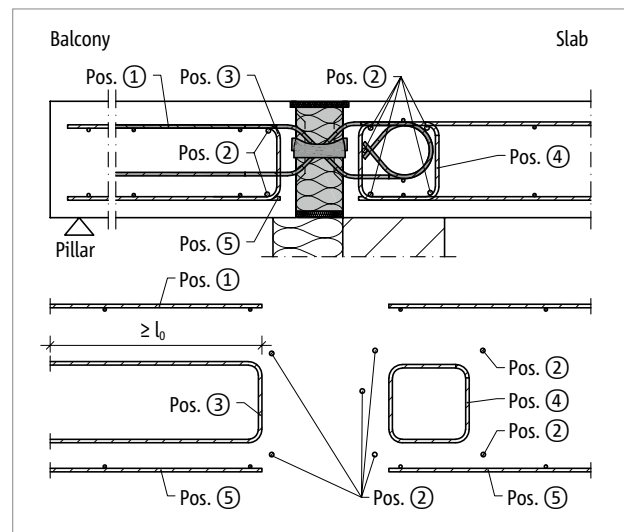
Schöck Isokorb® type Q-E-W-VV: On-site reinforcement
